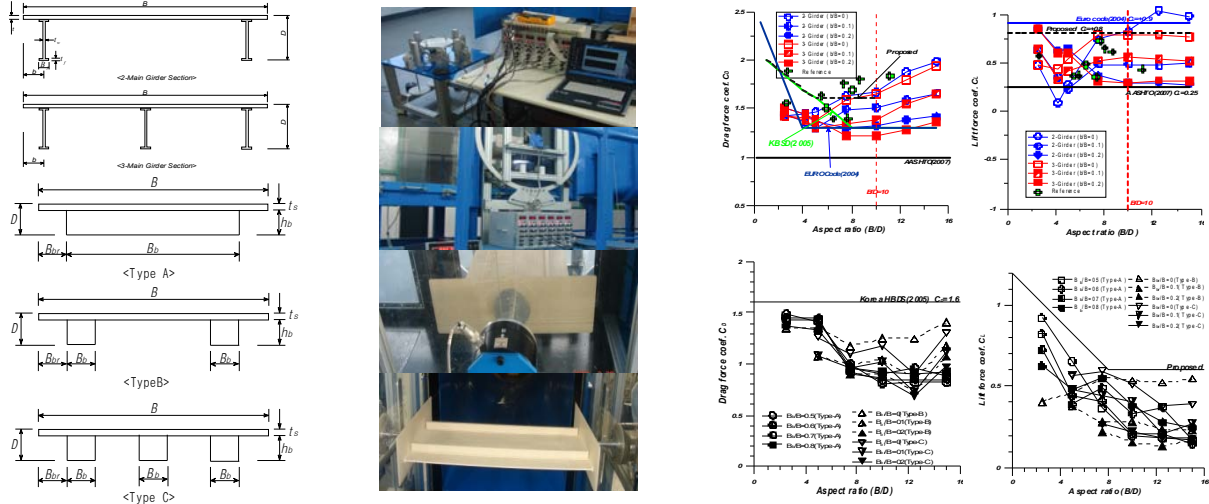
Plate / Box Girder cross-section of static wind coefficient recommendation
